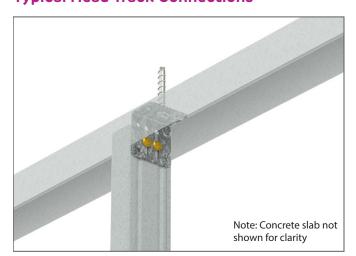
Head Track Connection HC4 using UB60 Heavy Duty Connection for 64mm and 76mm studs Perspective
